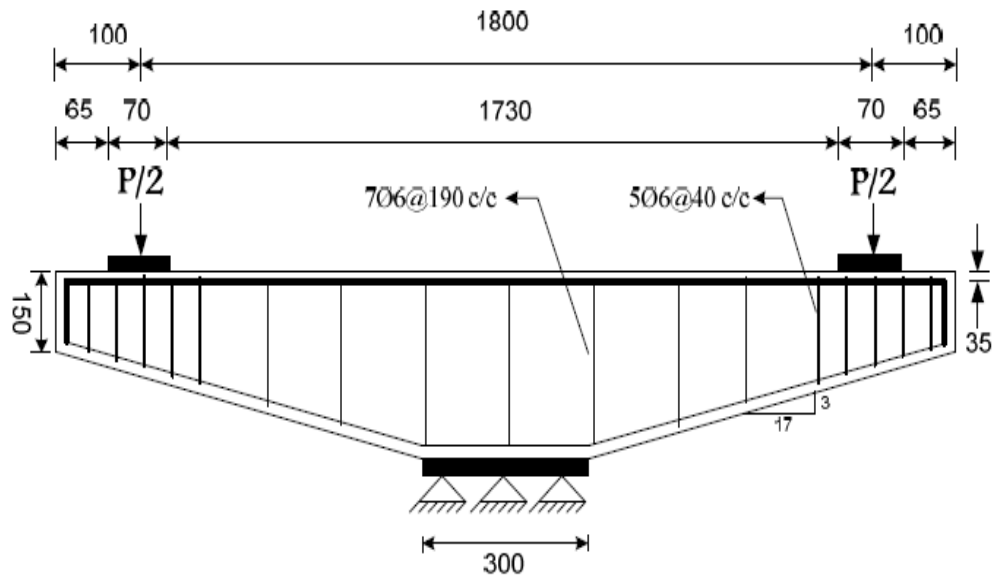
Specimens tested beams by (Debaiky and Elniema 1982)
